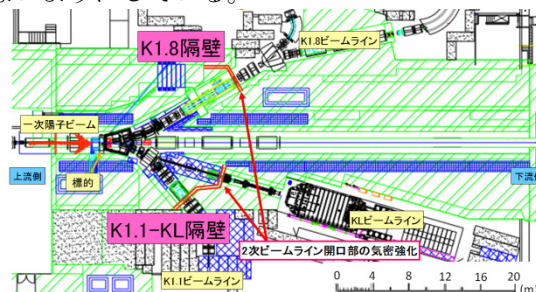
Layout of the double airtight wall in the Hadron experimental Hall.
